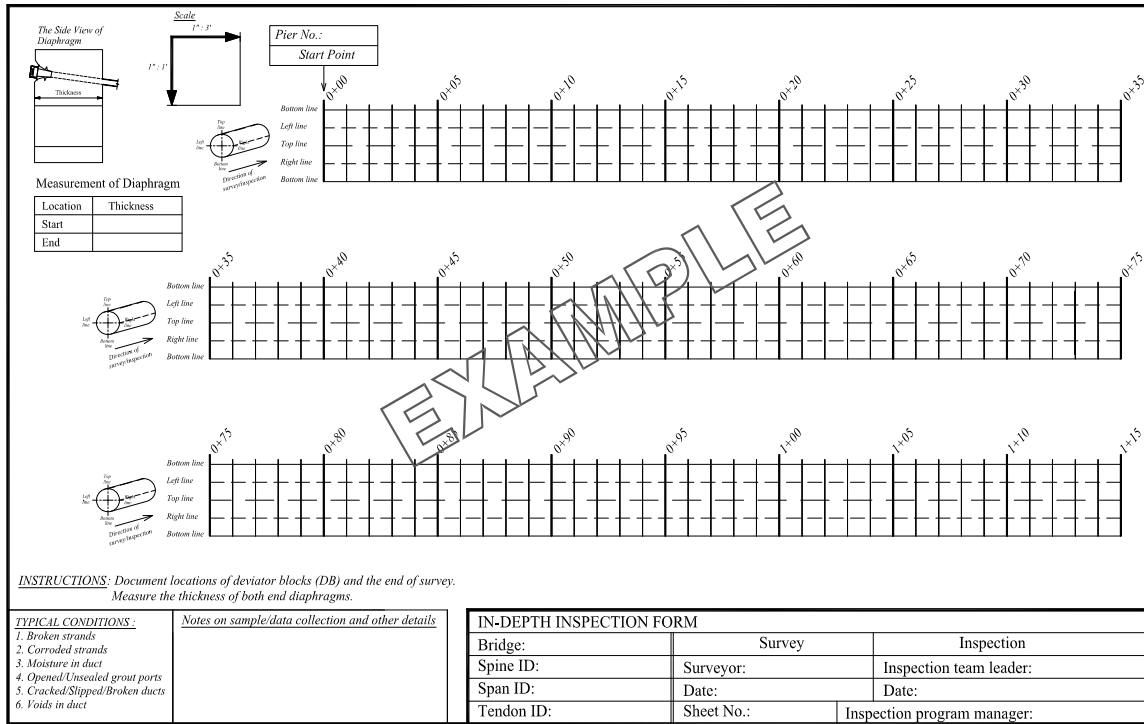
In-Depth Inspection Sheet before Marking Location of Deviator Block.
